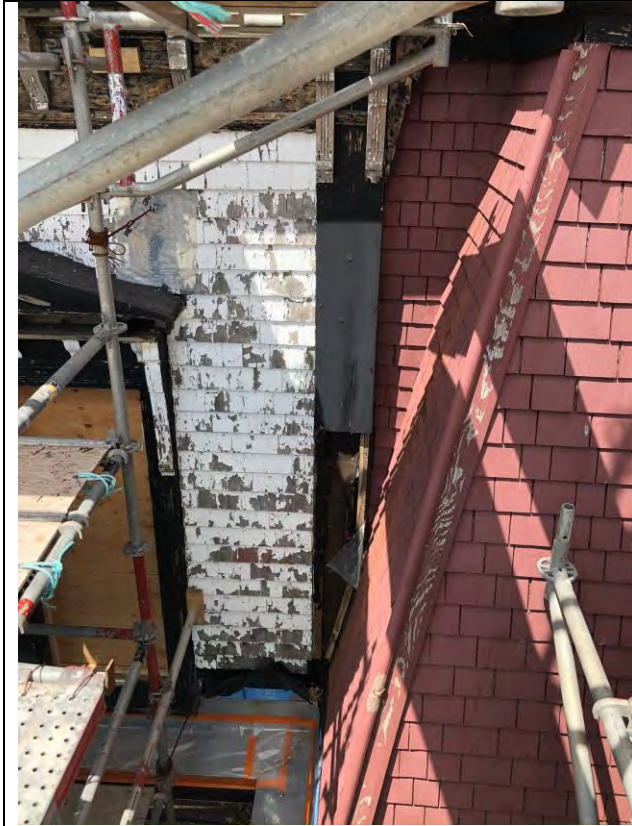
Area of white painted shingles cladding beside roof to be completed. Note Cladding not completed and flashing detail not completed yet.
